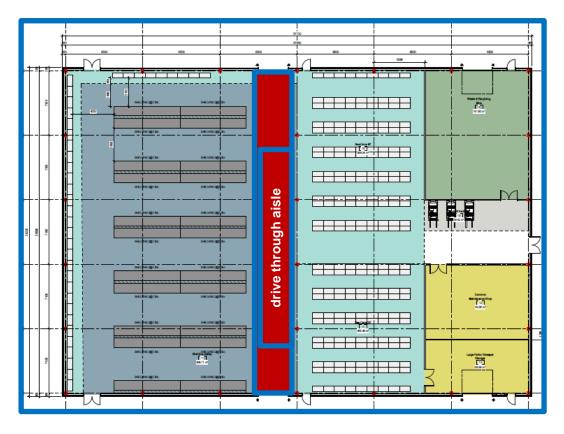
Floor Plan of Purpose-Built Storage Building with drive through aisle
